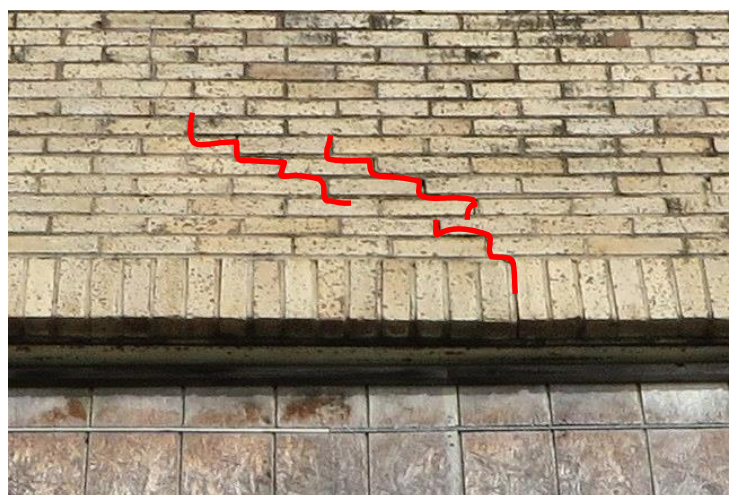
Typical cracking in the masonry veneer (highlighted for emphasis) caused by rust-jacking at corroded steel lintels.
